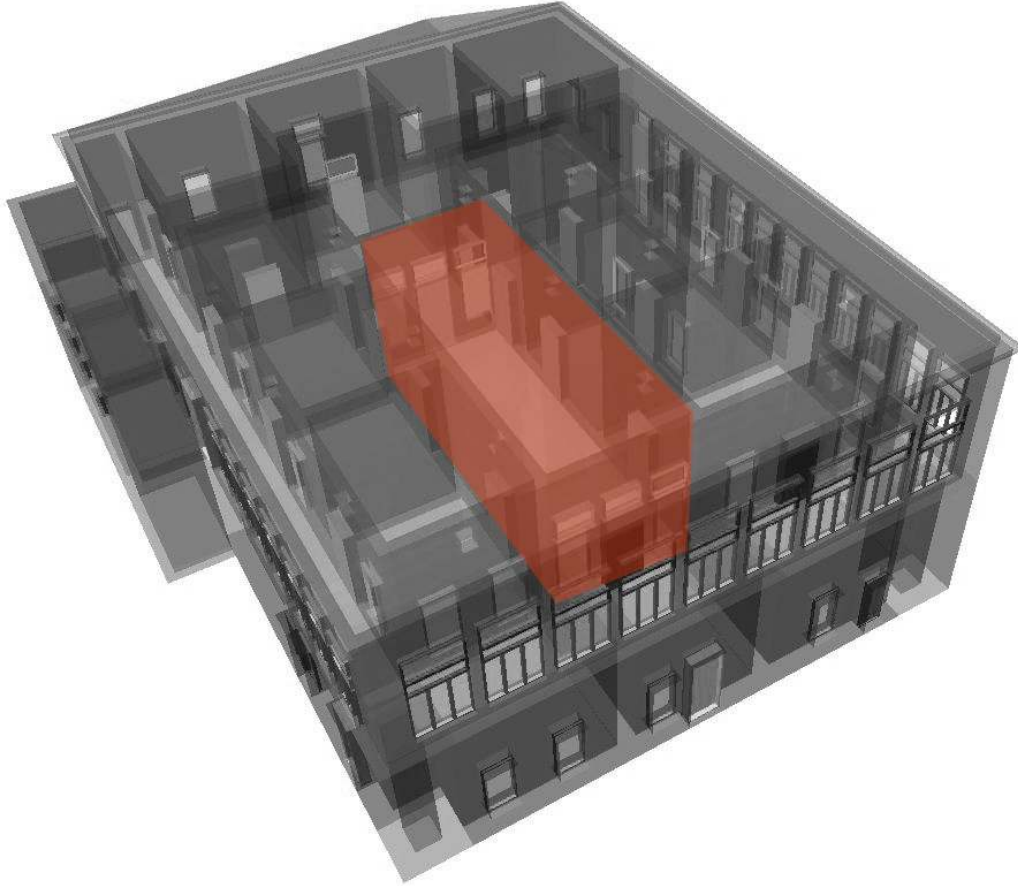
a 3D model of the house at 19 Ma’ale Ha-Shihzur Street, used for the simulation, with the central hall highlighted in red (looking from east to west)
